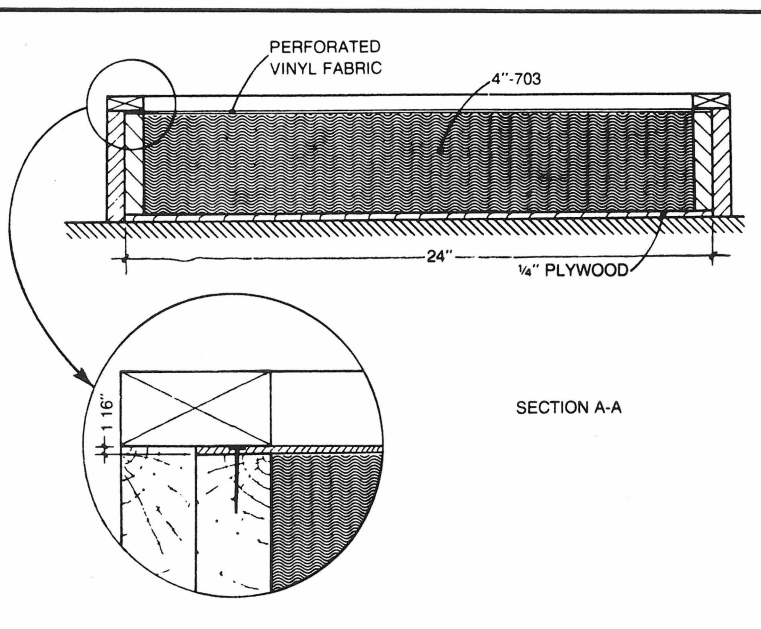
Constructional details of 2 foot \times 8 foot wall absorbing panels covered with vinyl fabric. The frame and spacer width must be adjusted to accommodate the 4 inch semi-rigid glass fiber board without bulging of vinyl cover.
